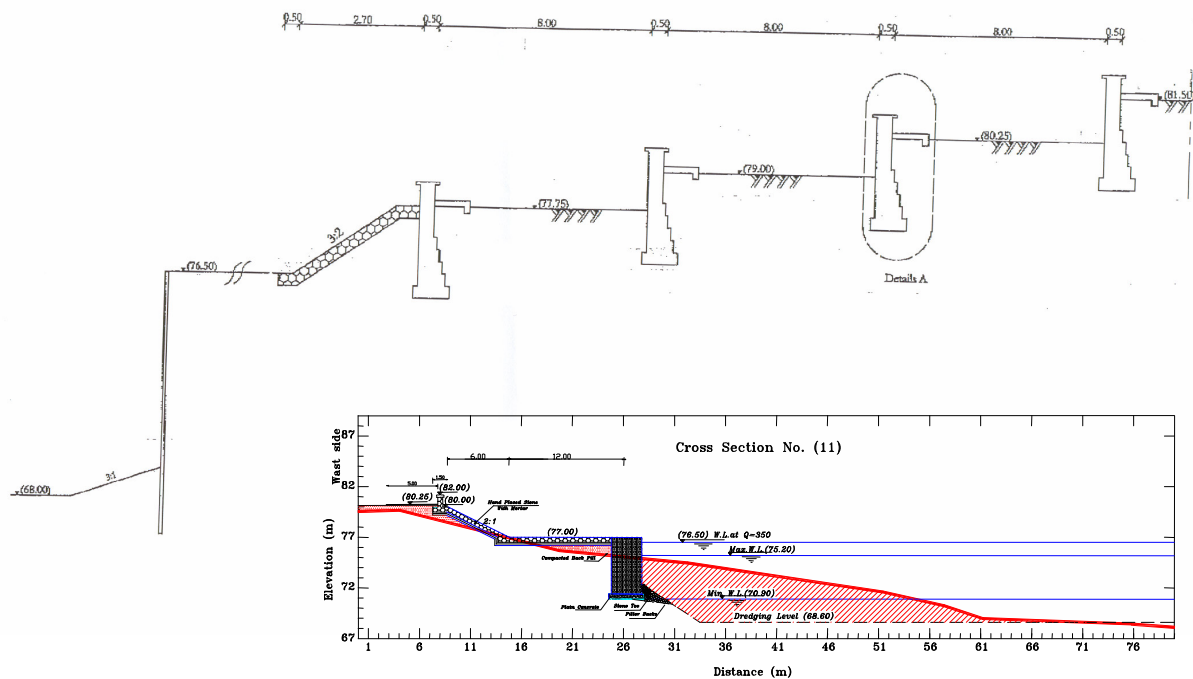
Typical design cross section at the berth location indicating the diaphragm wall
